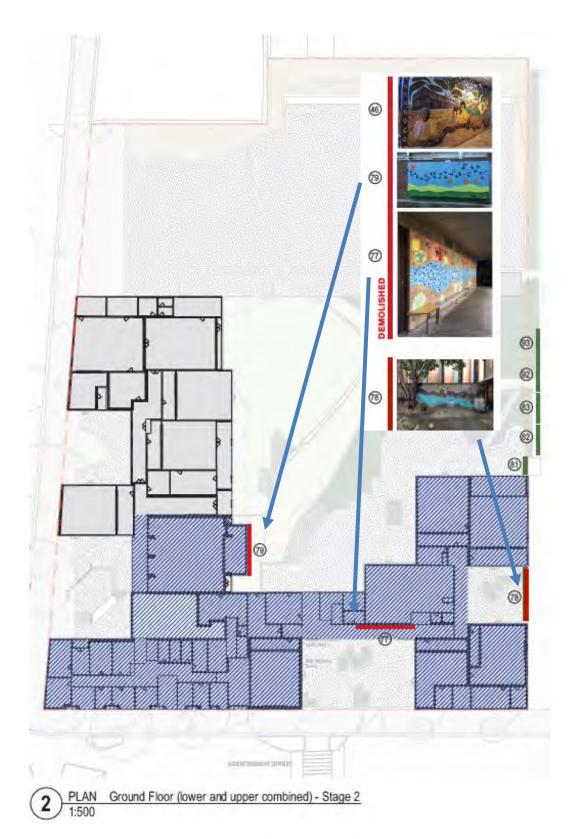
Brick Mural Demolition Plans, Stage Two. (Source FJMT 2020)
